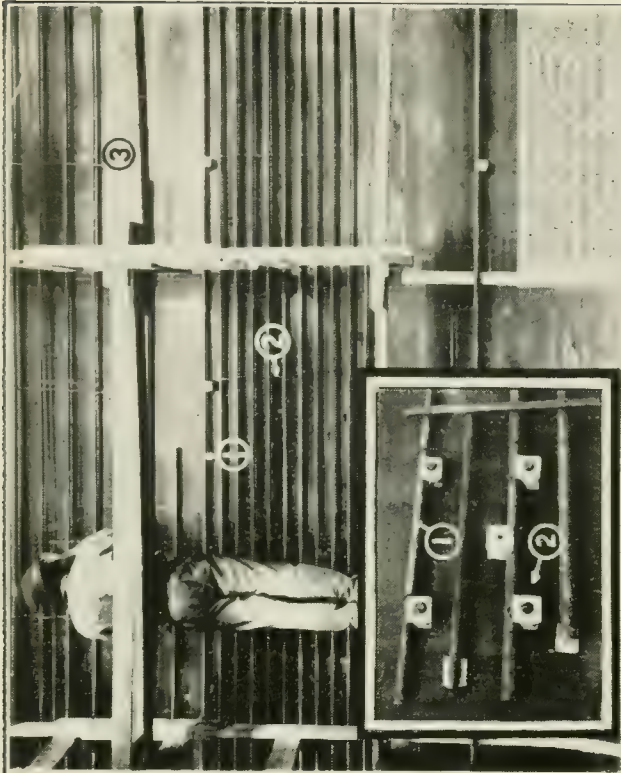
BOTTOM AND SIDE SHELL REINFORCING STEEL PLACED WITHIN THE OUTSIDE FORMS.
